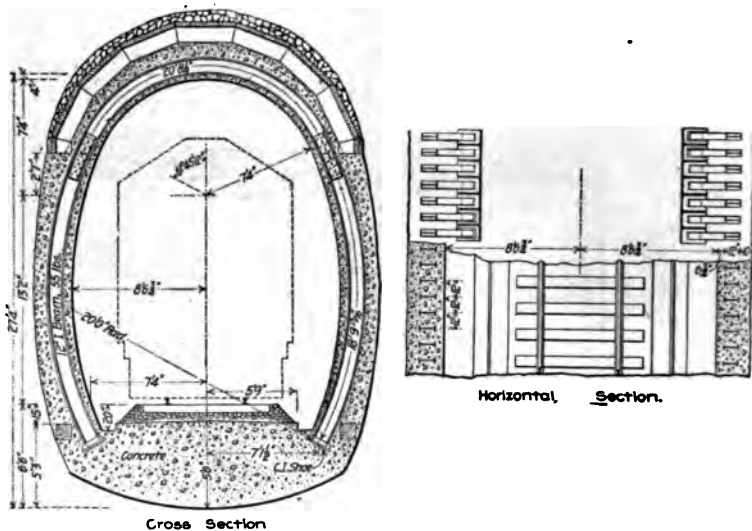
Aspen Tunnel, Union Pacific Ry.
